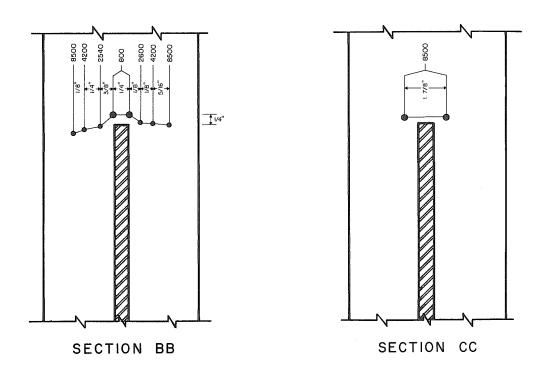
JOINT TYPE 3 - SPECIMEN No. 3 (TAPERED GUSSET PLATE) DETAILED CRACK PROPAGATION IN DIAGONAL MEMBER
